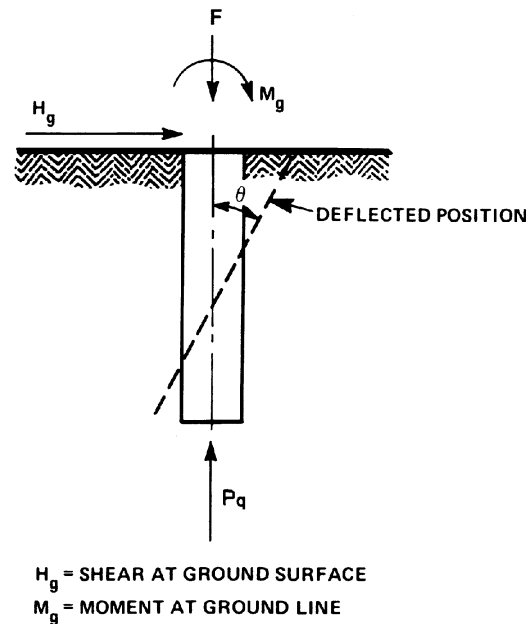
Rigid type pier (after Davisson [1969], with notation altered).
